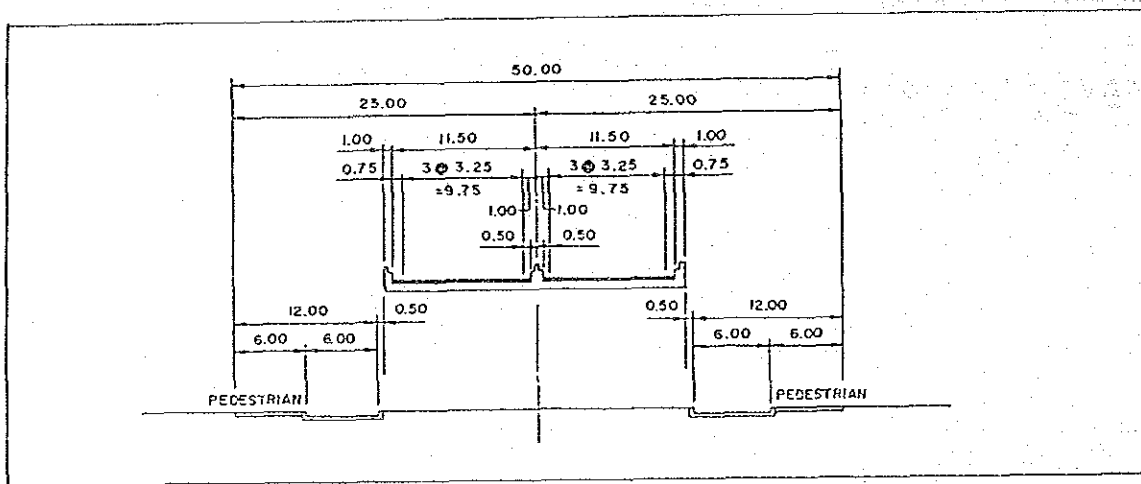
Typical Cross-Section (STA.6 - 12)
